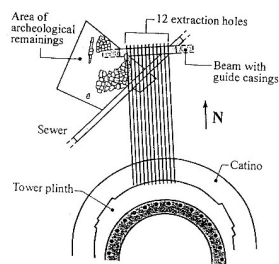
Preliminary underexcavation experiment beneath the tower: layout
